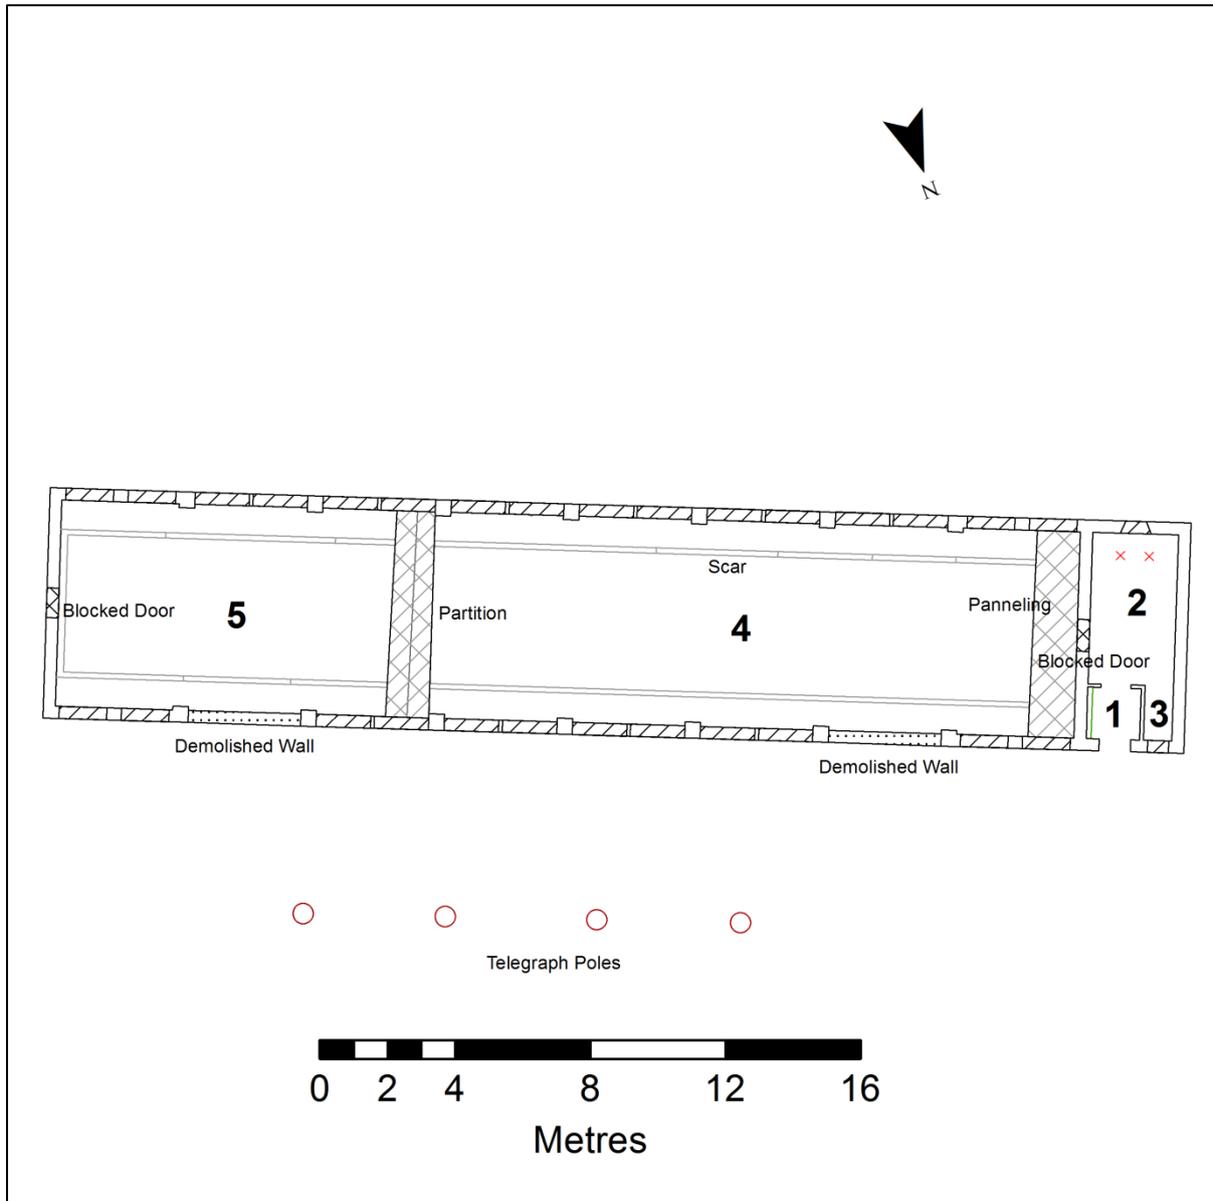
Floor plan of the Transmitter Building (Gregory 2013).
